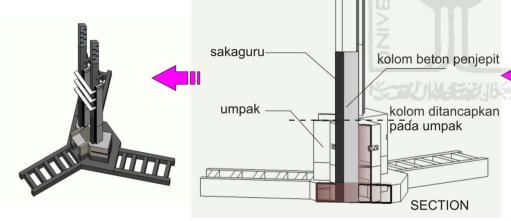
DETAIL OF SAKA GURU AND UMPAK CONNECTION
